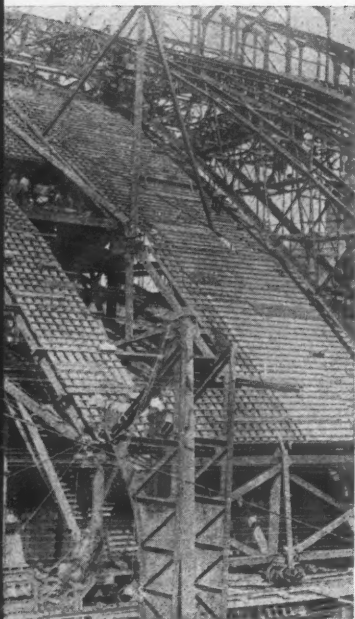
Bottom Sections of Arches 1 and 2, Looking Southeast. April 21
